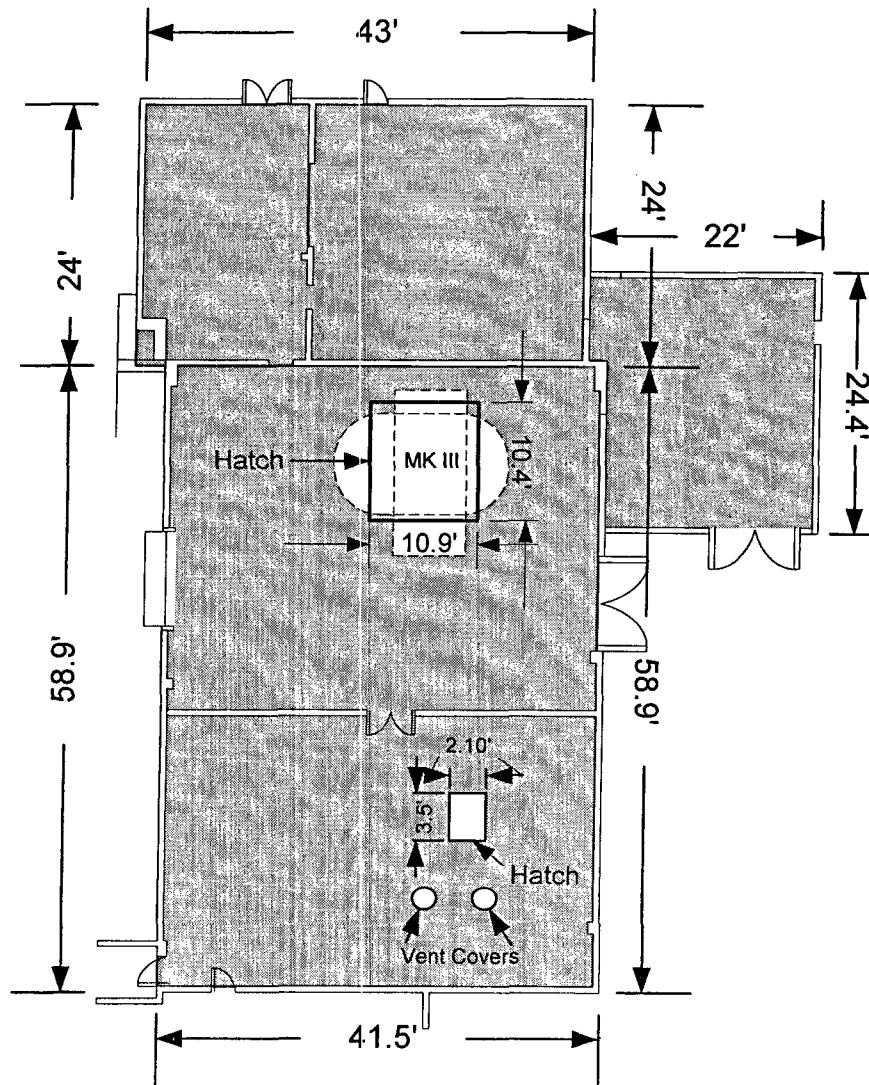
Building 21 (TRIGA) Roof Gravel Sample Locations
